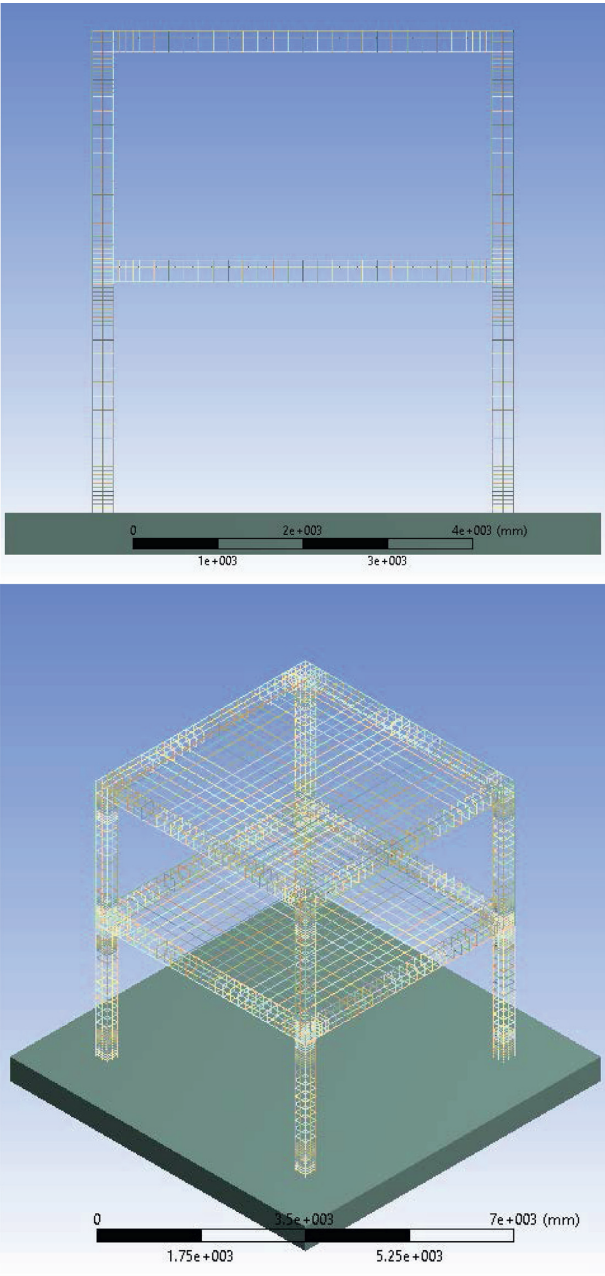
Reinforcement detailing for FRM_REI_DET_#2 on AUTODYN.
